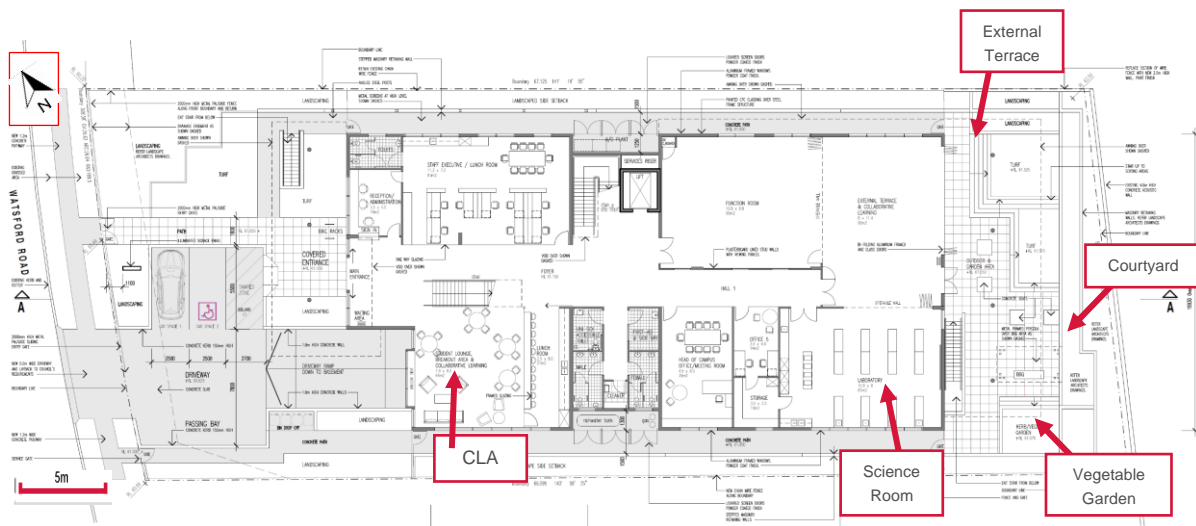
Proposed ground floor plan (Source: Applicant's EIS)
